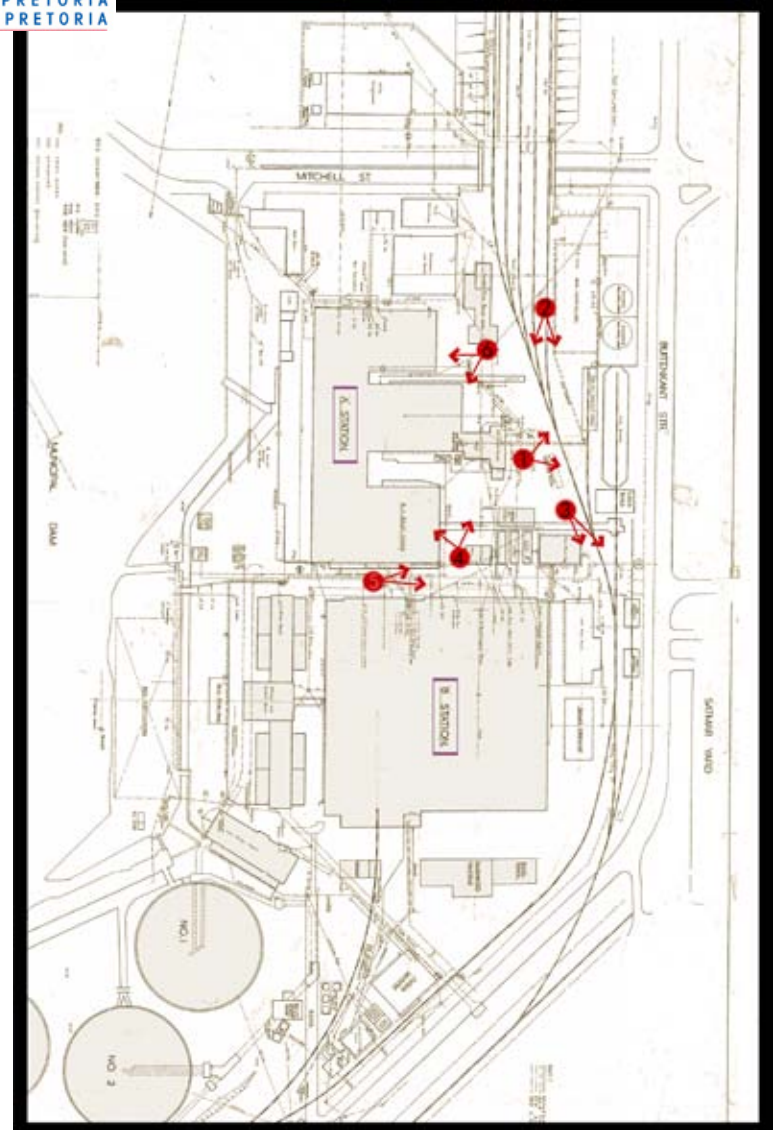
Site Plan of existing structures on site, note Station A and B as well as views 1 to 6 (page 31)
